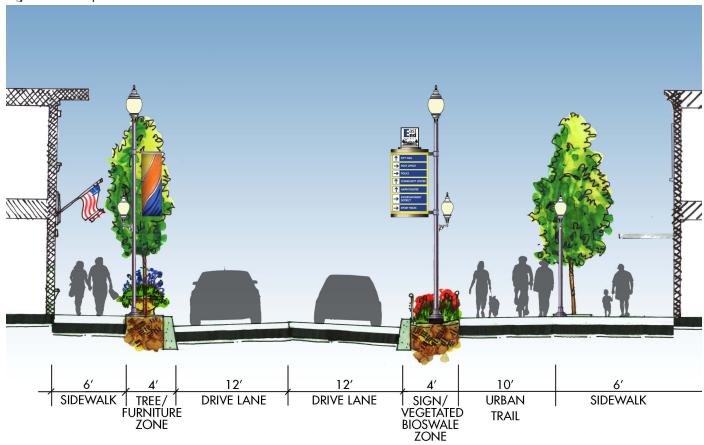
Proposed Cross Section - Fourth Street Urban Trail
